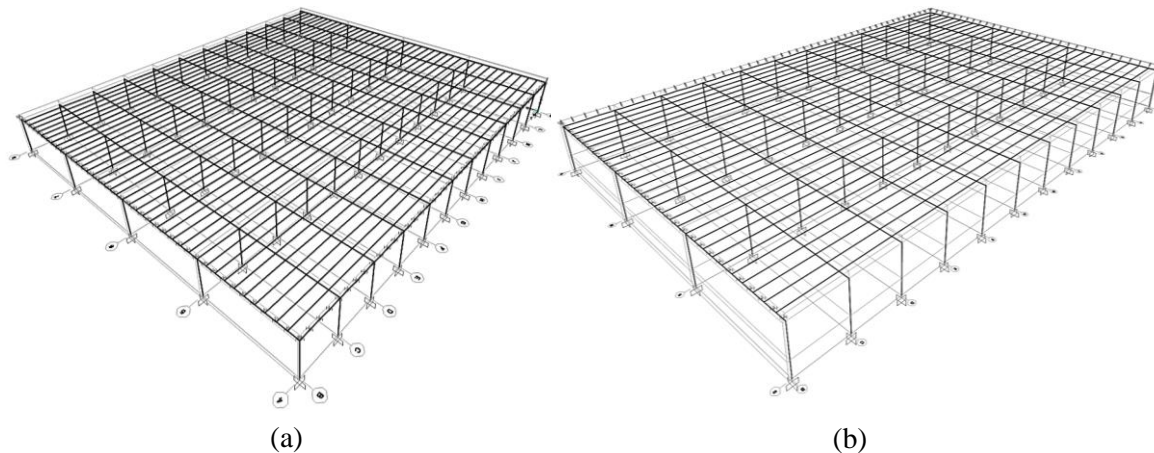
(a) Building A model in SAP2000. (b) Building B model in SAP2000.
